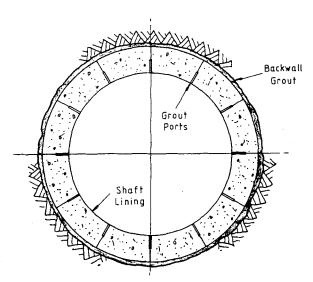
Typical Arrangement for Backwall Injection in a Shaft.
